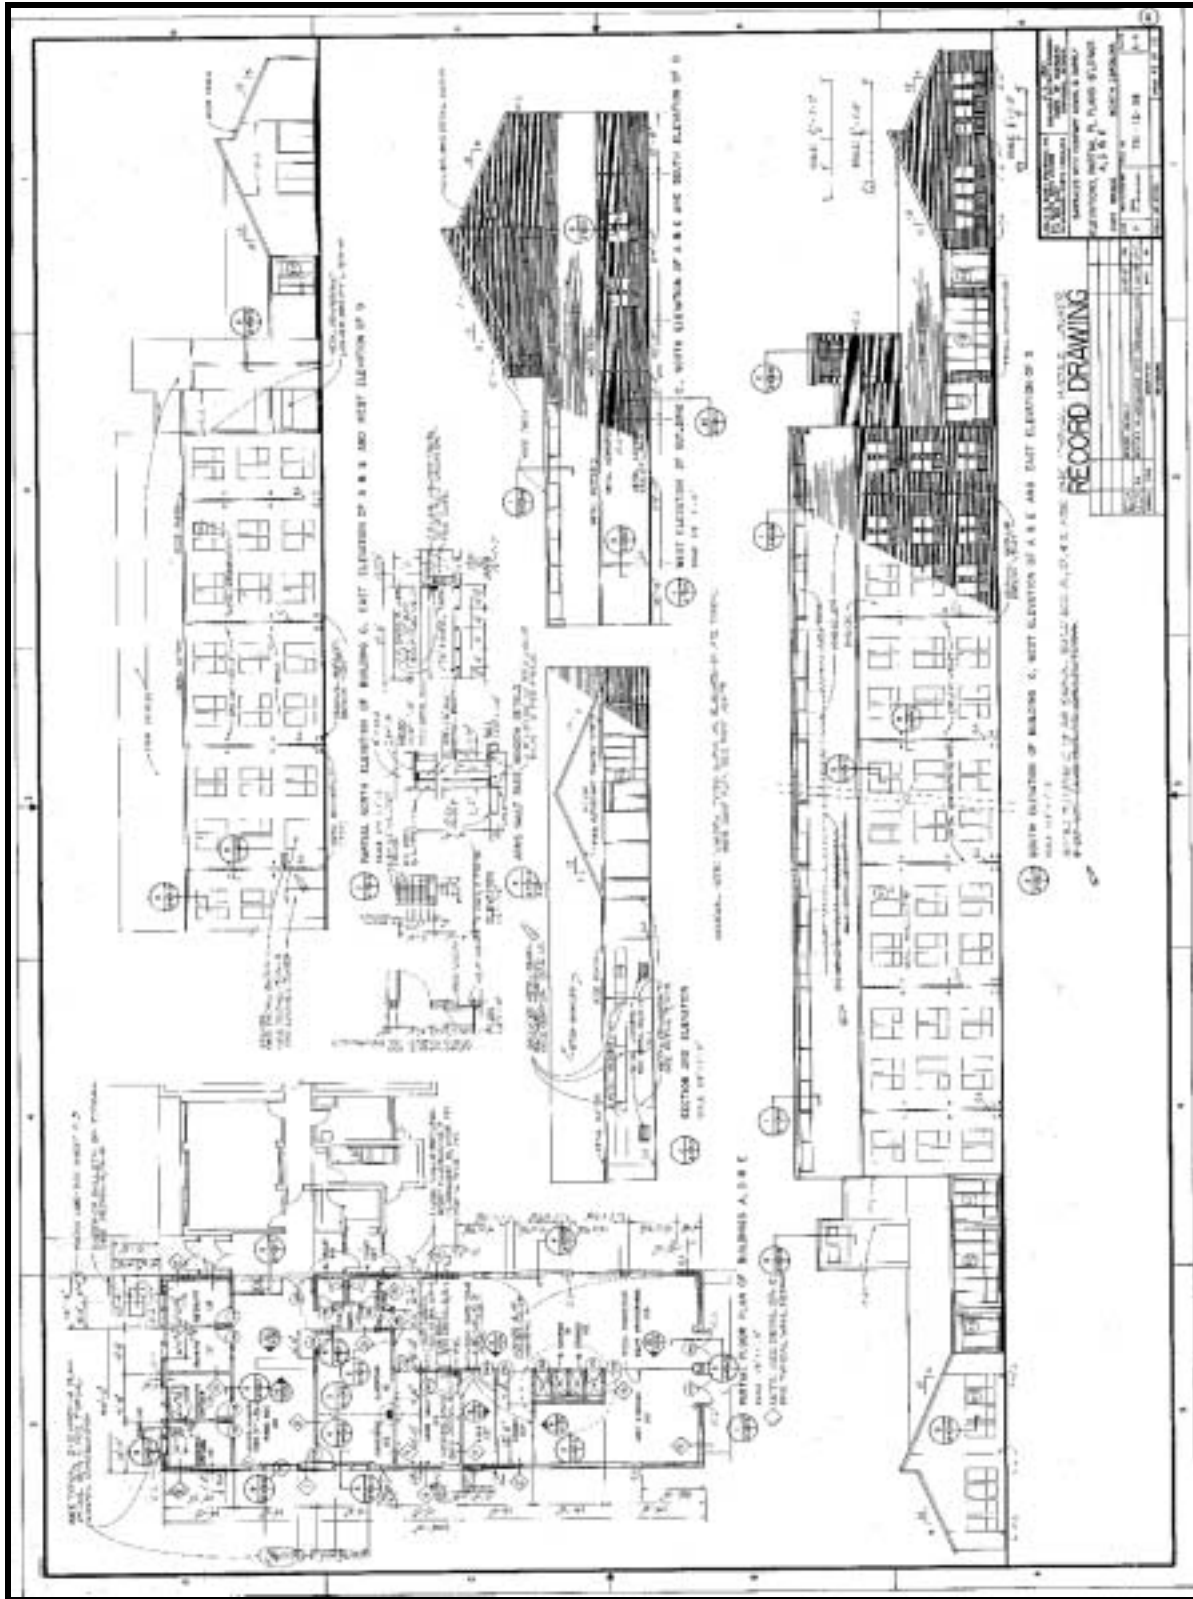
Quadrangle barracks, elevations and partial floor plans, Ft. Bragg (1985, revised 1987) (Engineering, Ft. Bragg).
